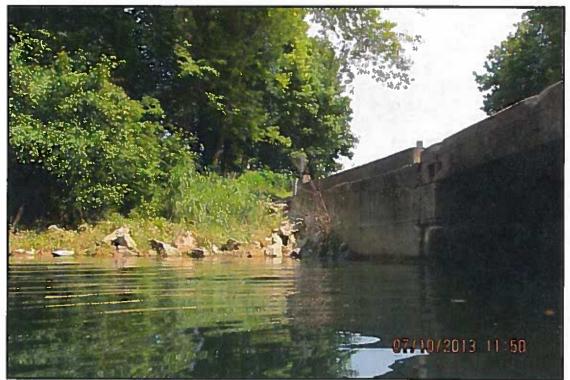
View of Failed Concrete Repair at Upstream Corner of Abutment 1, Looking South.
